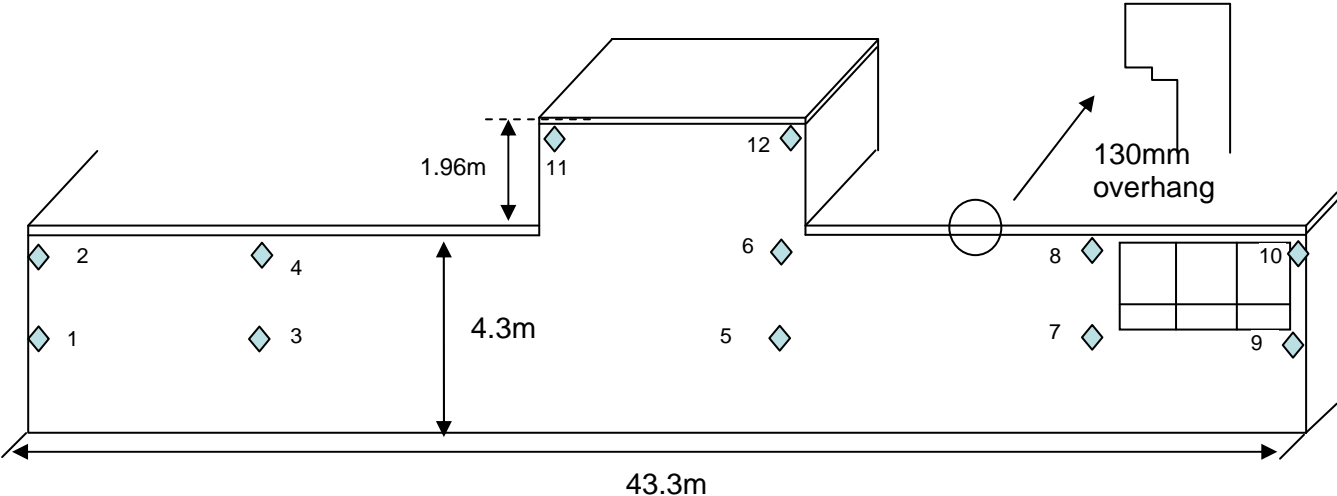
Location of rain gauges installed on the east façade of Bldg. 8.
